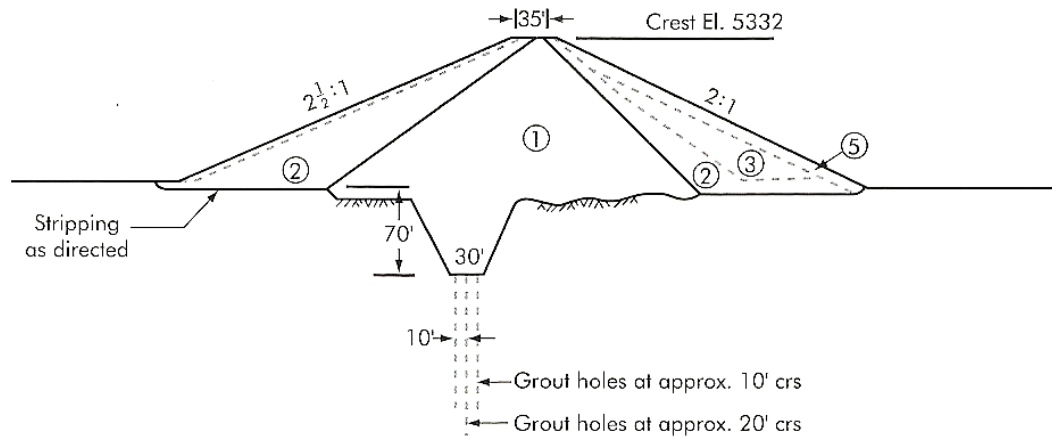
Schematic diagram of the Teton Dam: Section with a deep cut-off trench at failure position in right abutment, [6].
